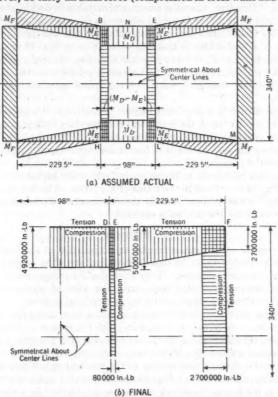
Moments, M, in a Rectangular Frame with Two Cross Walls
